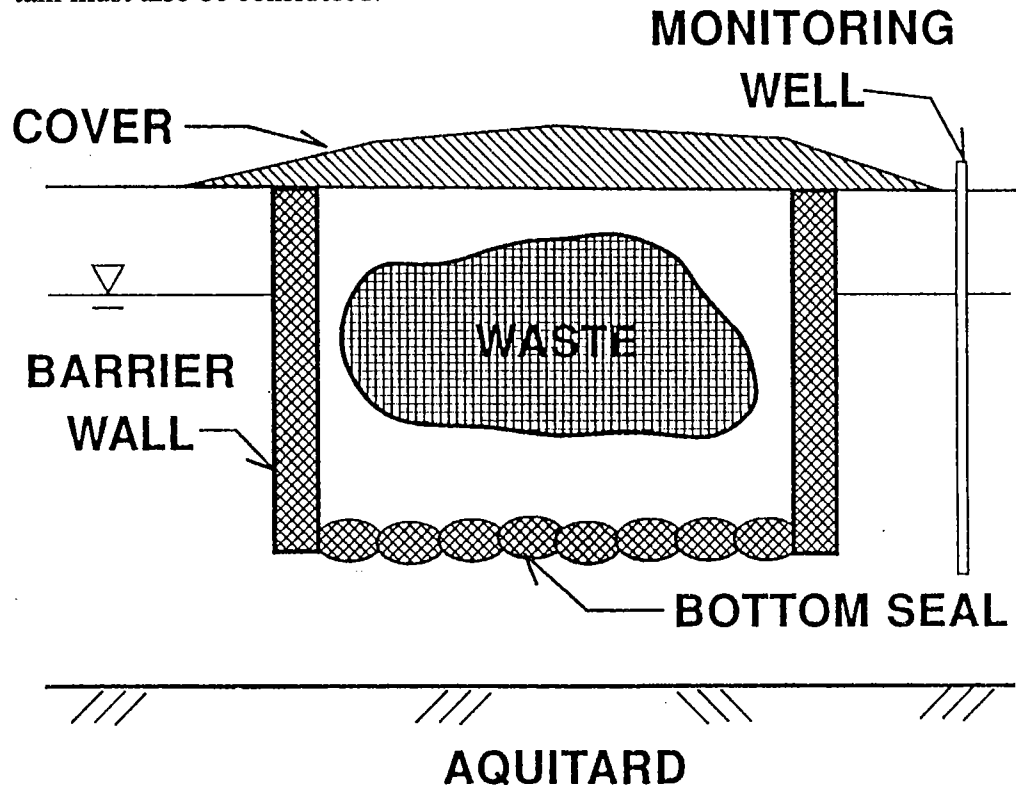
Schematic Diagram of a Typical Waste Containment Barrier System
